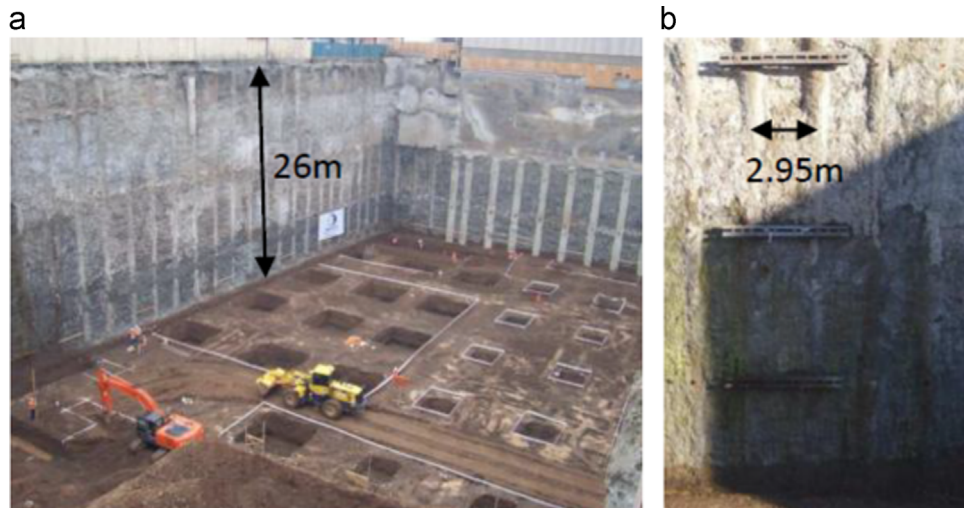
Typical excavation with non-secant anchored piling support. Beauchef building in Santiago, Chile [32].
